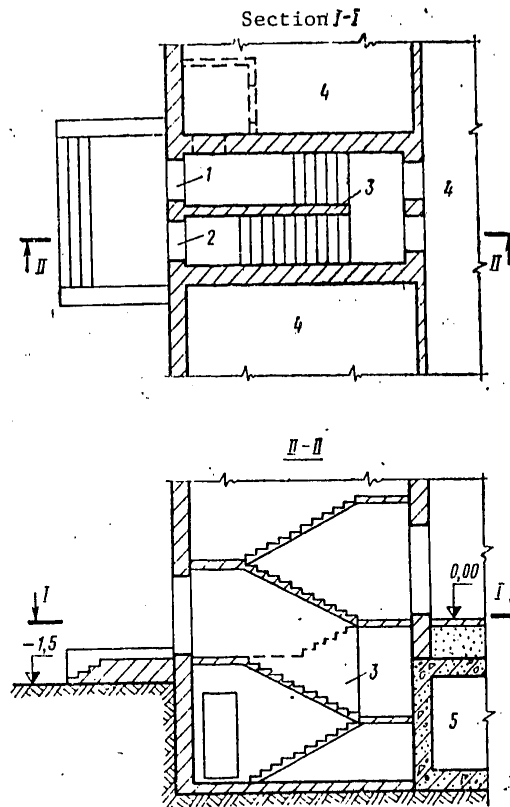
Entrance to shelter with DES from stairwell of multistory building
